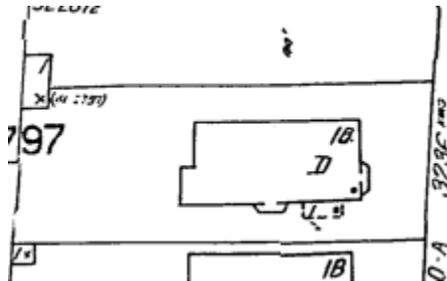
Site plans of 3236 King Street in 1950. North is up.
